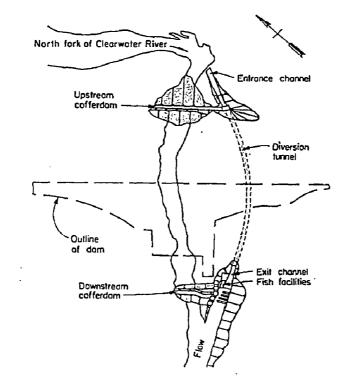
Dworshak dam-Genaral plan of diversion facilities
